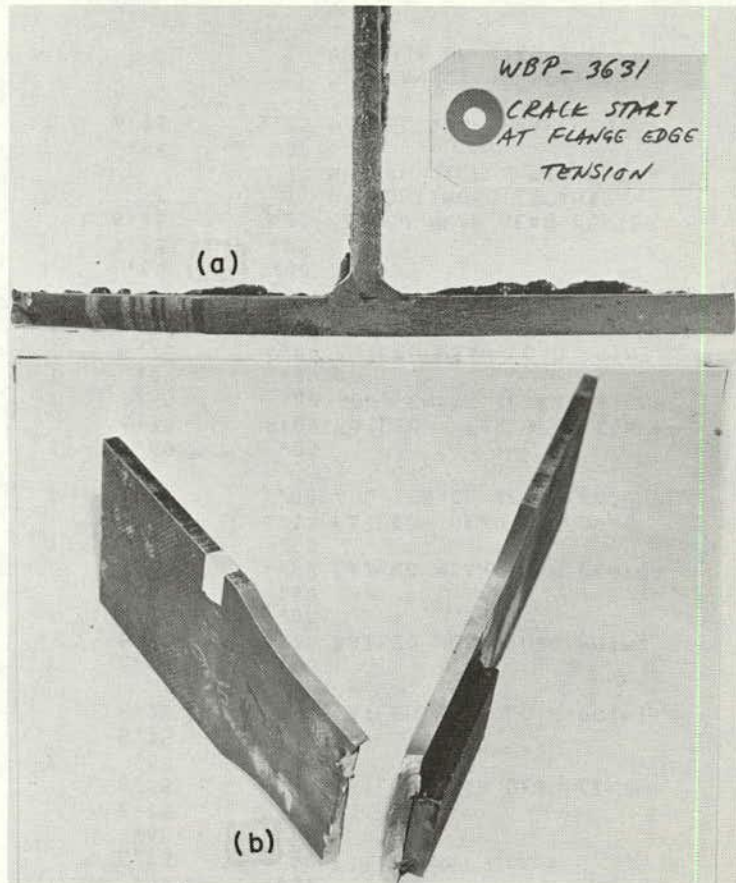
Typical crack types: (a) edge crack, designation type E; (b) cover-plate crack, designation type C.
